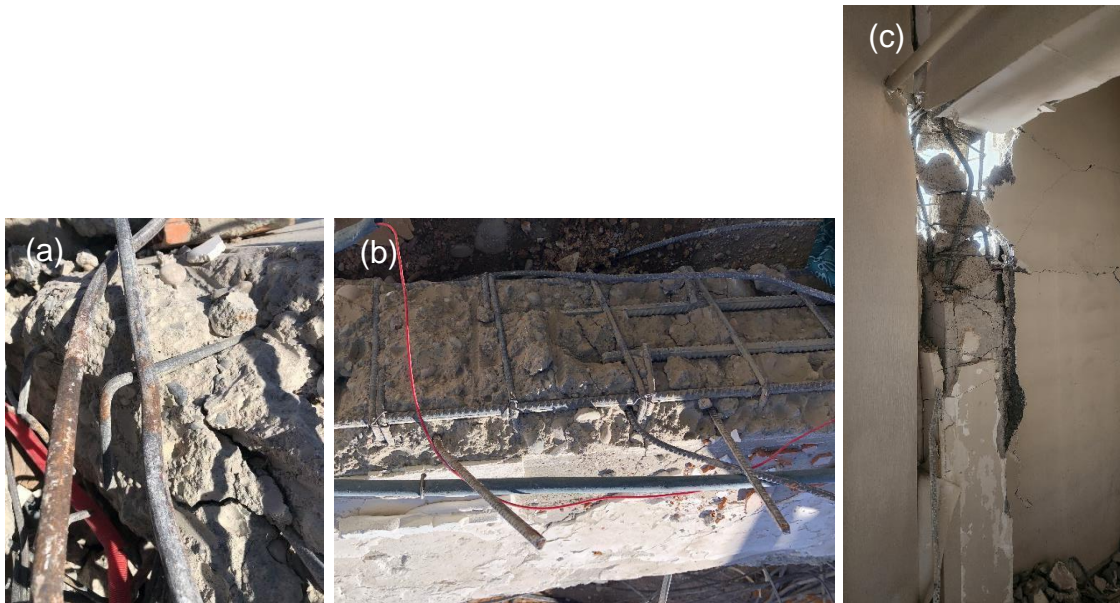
Reinforcing steel details which must be capable of withstanding tensile stresses. (a) Plain round rebars; (b) 90° hooks at the end of stirrups; (c) Stirrup tightening zone.
